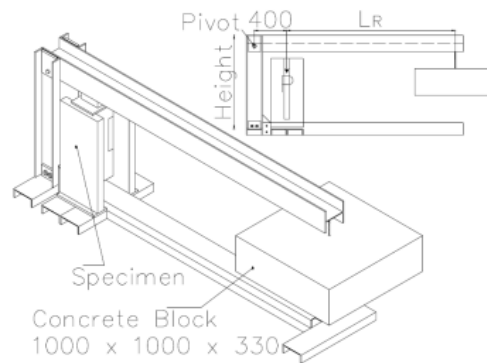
Sustained load test on connections and the cross-section of the TCC beams (Yeoh et al. 2010)
